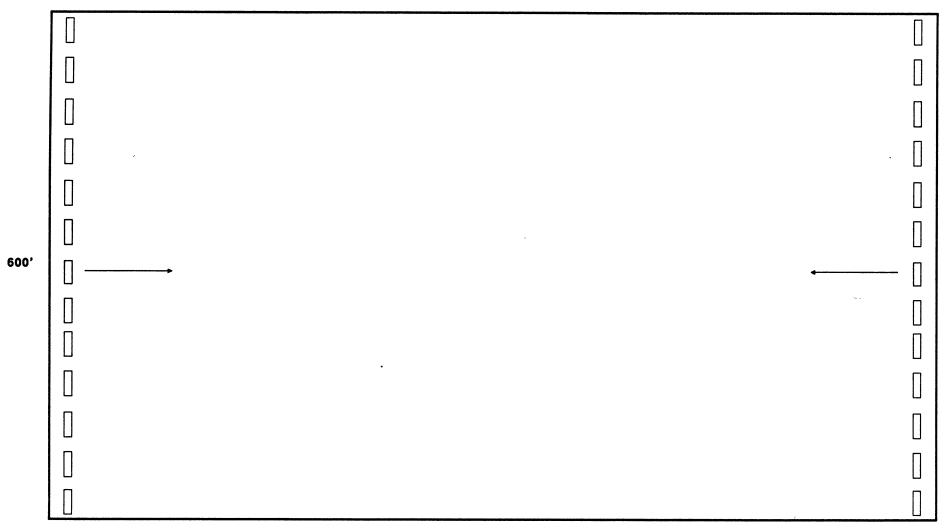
TYPICAL OFFICE BUILDING FLOOR LAYOUT
